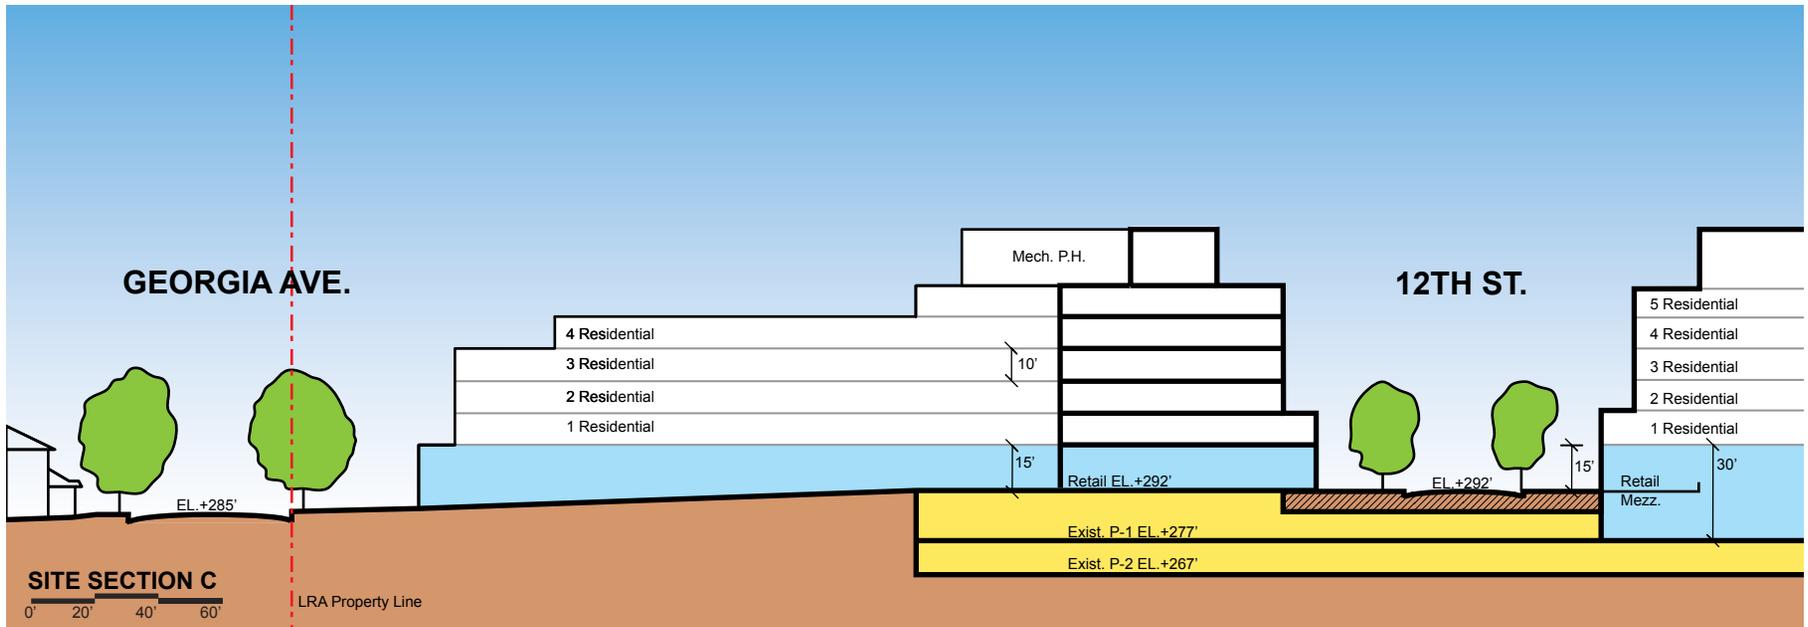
Town Center Site Section. Source: Perkins+Will.
